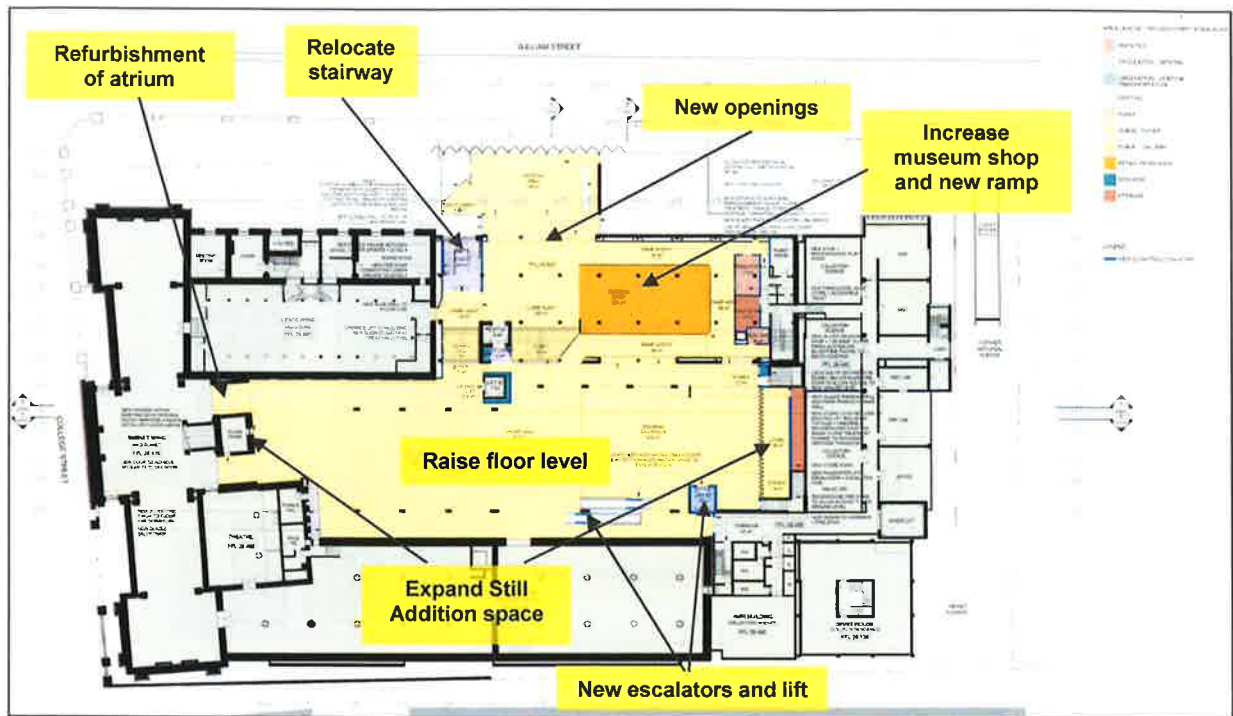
| Ground Floor floor plan (Source: Applicant's RtS).
